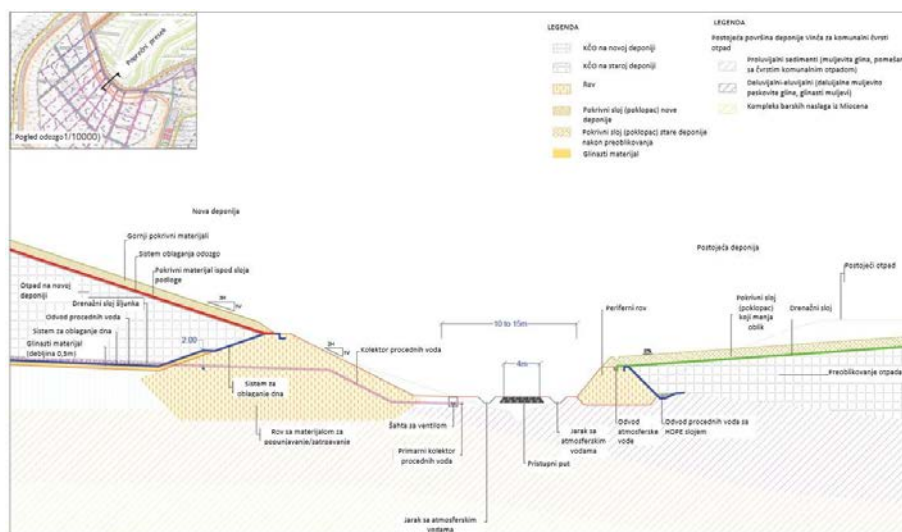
Typical cross-section between new and old landfill (Source: Suez Consulting, 2018)
